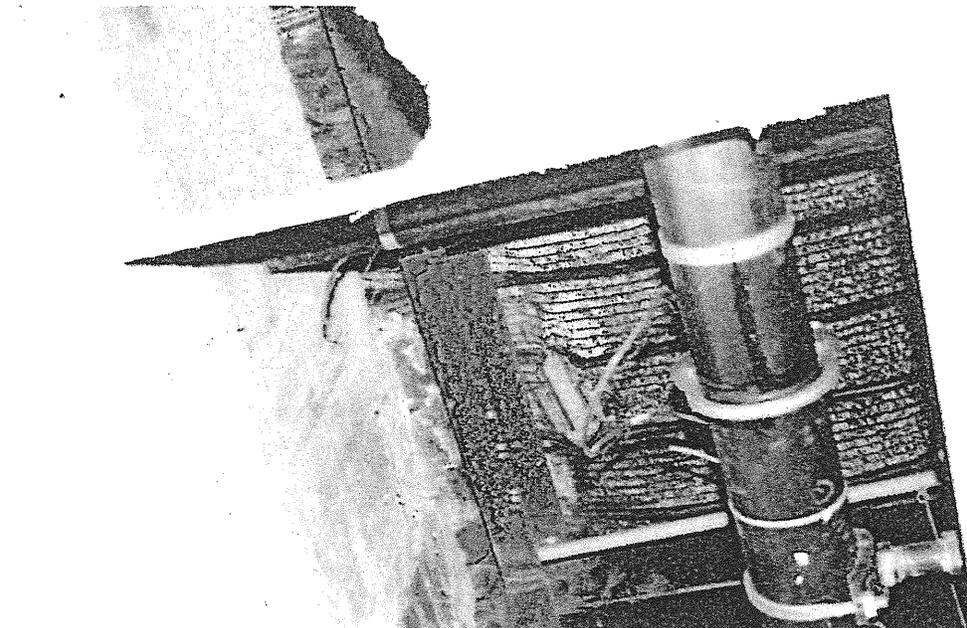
Partial view of newer structural steel added to the west side of the first floor structure.
